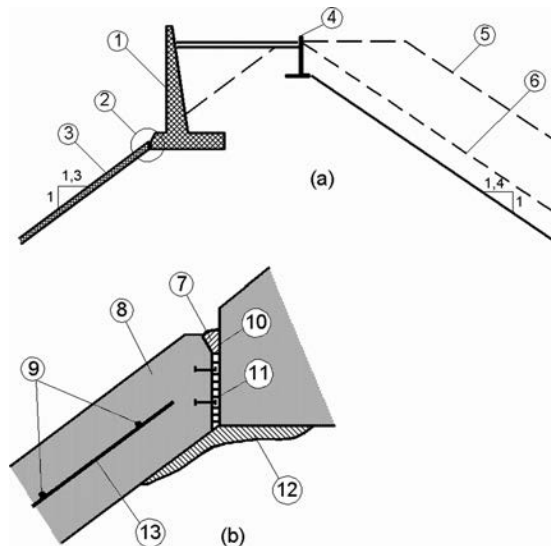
Detail of dam's crest (according to ICOLD 1989). (a) Detail of the crest; (b) detail of the joint. (1) parapet wall; (2) detail b; (3, 8) concrete slab; (4) downstream parapet wall; (5) additional embankment there were no wall; (6) additional embankment without downstream wall; (7) asphalt mastic; (9) horizontal reinforcement; (10) coating; (11) joint filling; (12) mortar bedding; (13) sloping reinforcement.
